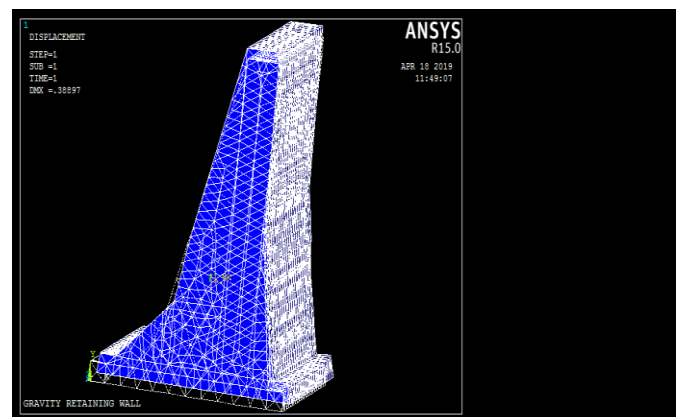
displacement of gravity retaining wall deformed plus undeformed shape
